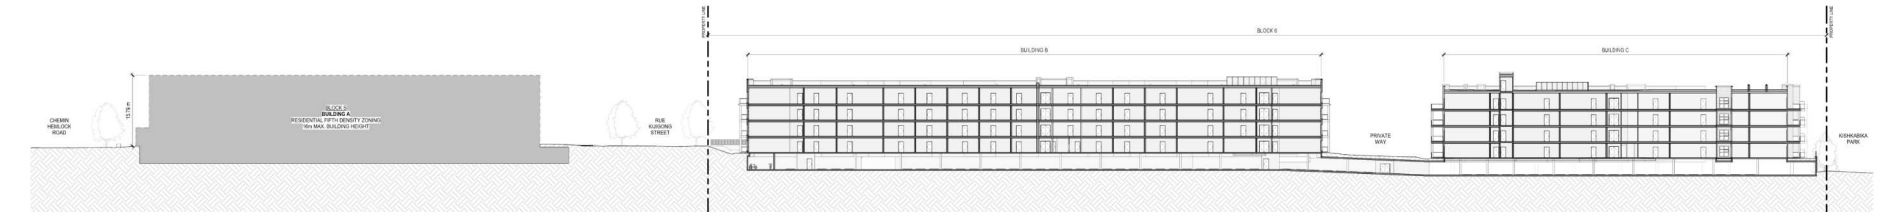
Longitudinal site section showing transitions between subject property and adjacent uses (not to scale) [September 2024].
